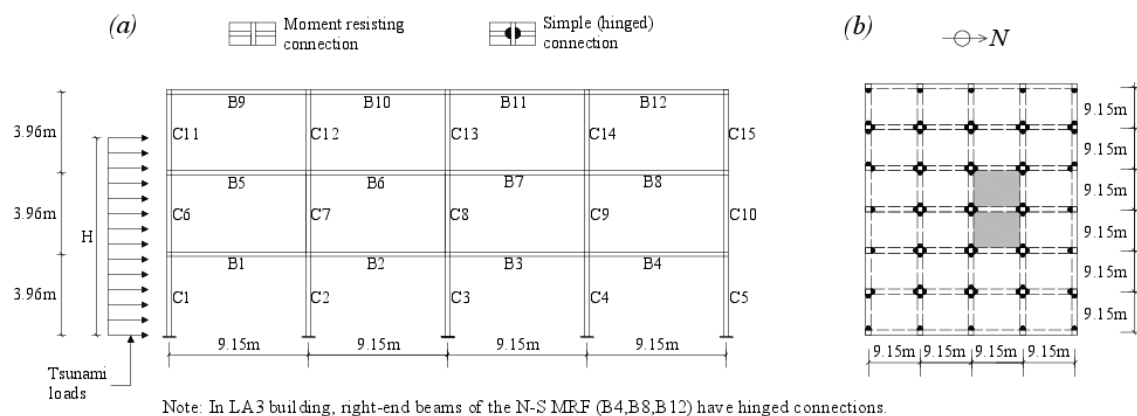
3-Story steel moment frame buildings (LA3 and SEA3 buildings): (a) elevation of the SMRF in the NS direction (exterior frame); (b) plan view.
